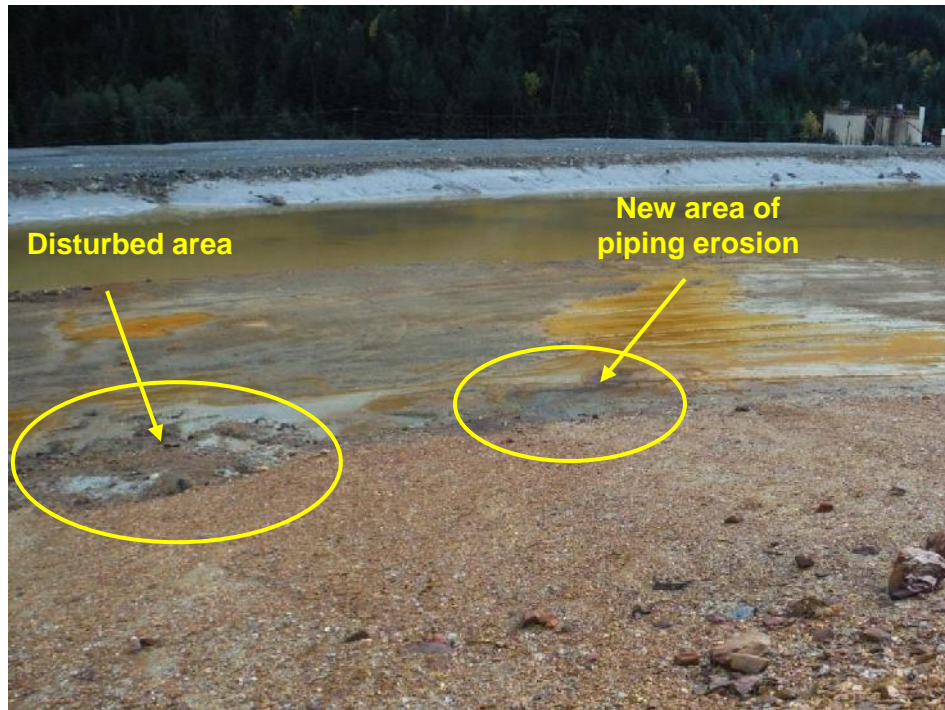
View looking south, down from crest of Paste Berm near the southeast corner. New area of piping erosion and adjacent area of former disturbance to the east.
